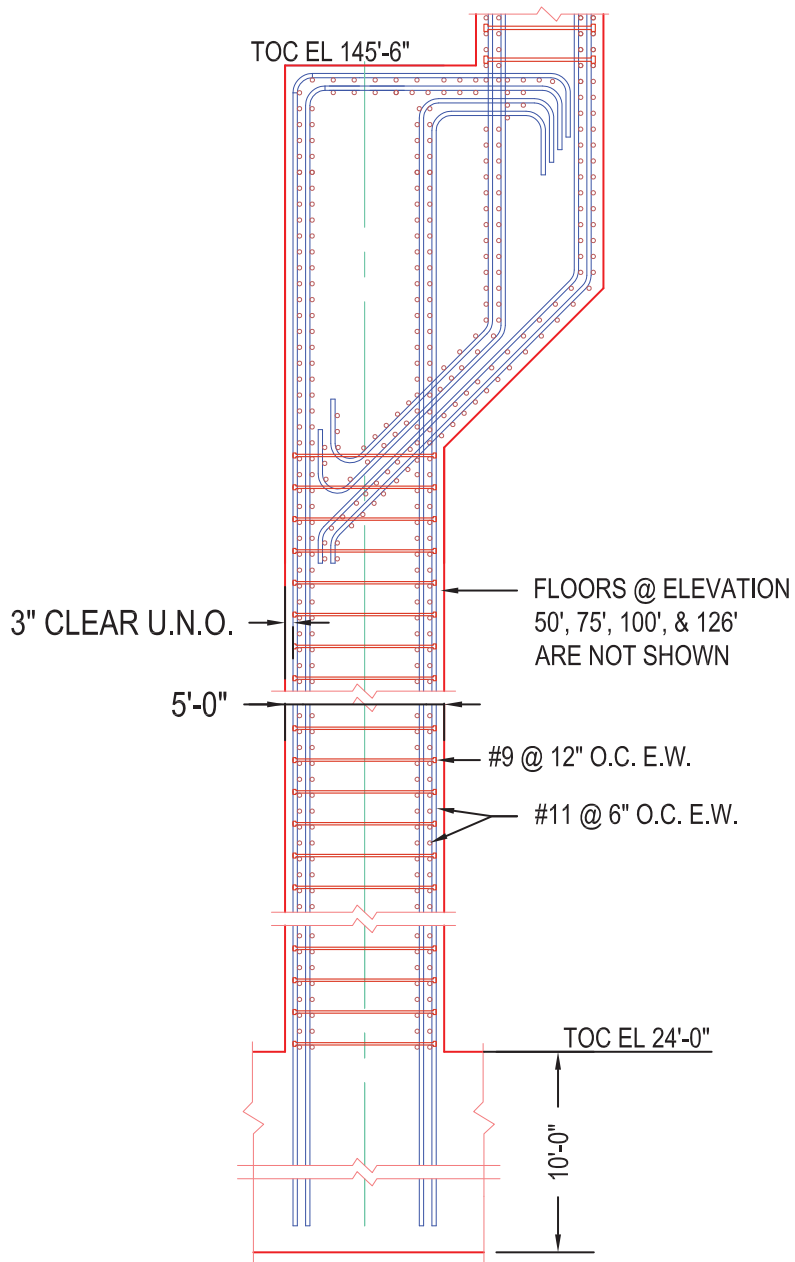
B-47: RXB Reinforcement Section View of RXB Wall at Grid Line B
